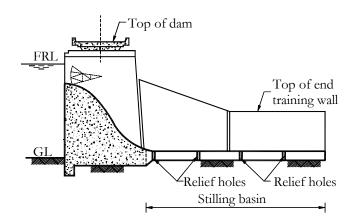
Relief holes or pipes in apron floor (IS: 11772 – 1986)
